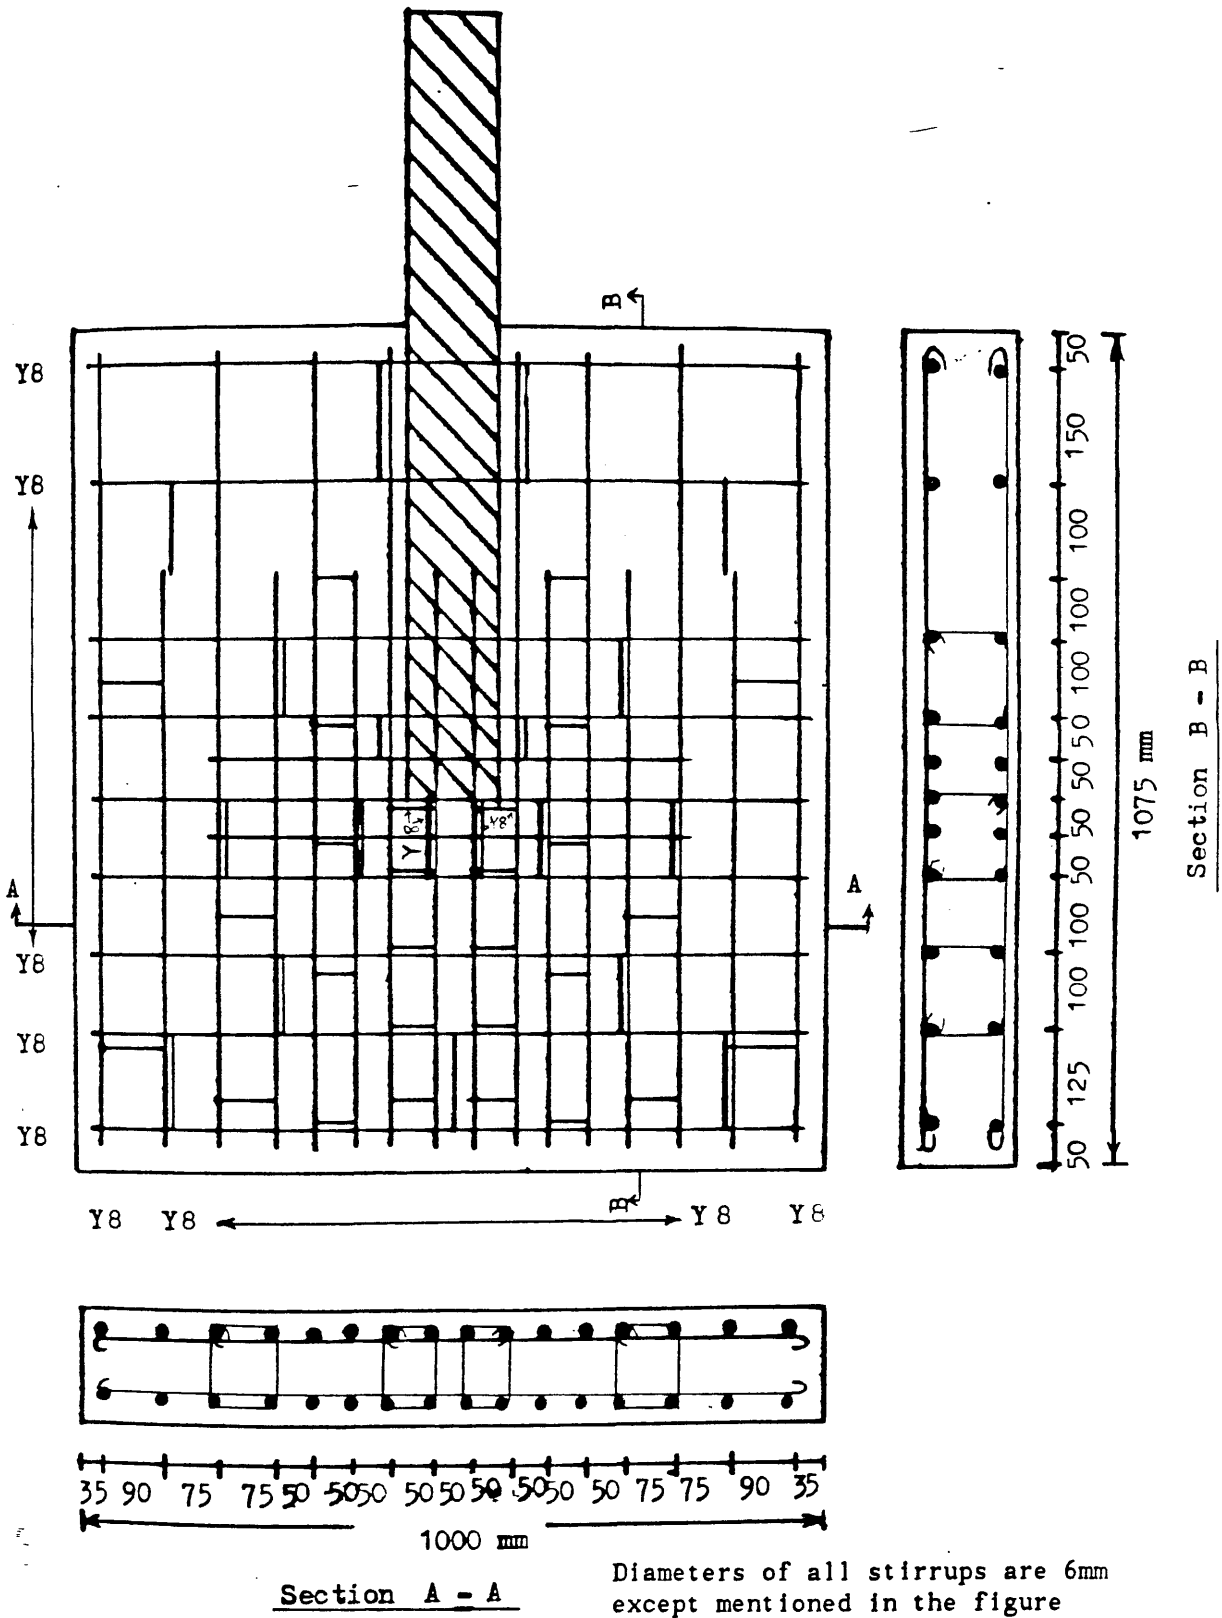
b) : Arrangement of bottom reinforcing bars including closed vertical stirrup in the slab of model MS7
